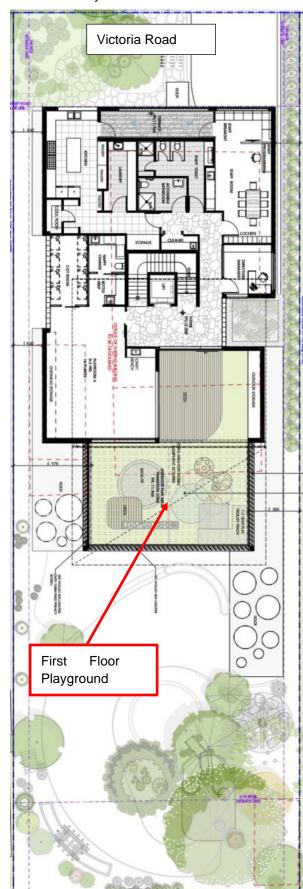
Proposed Child Care Centre Layout – First Floor
